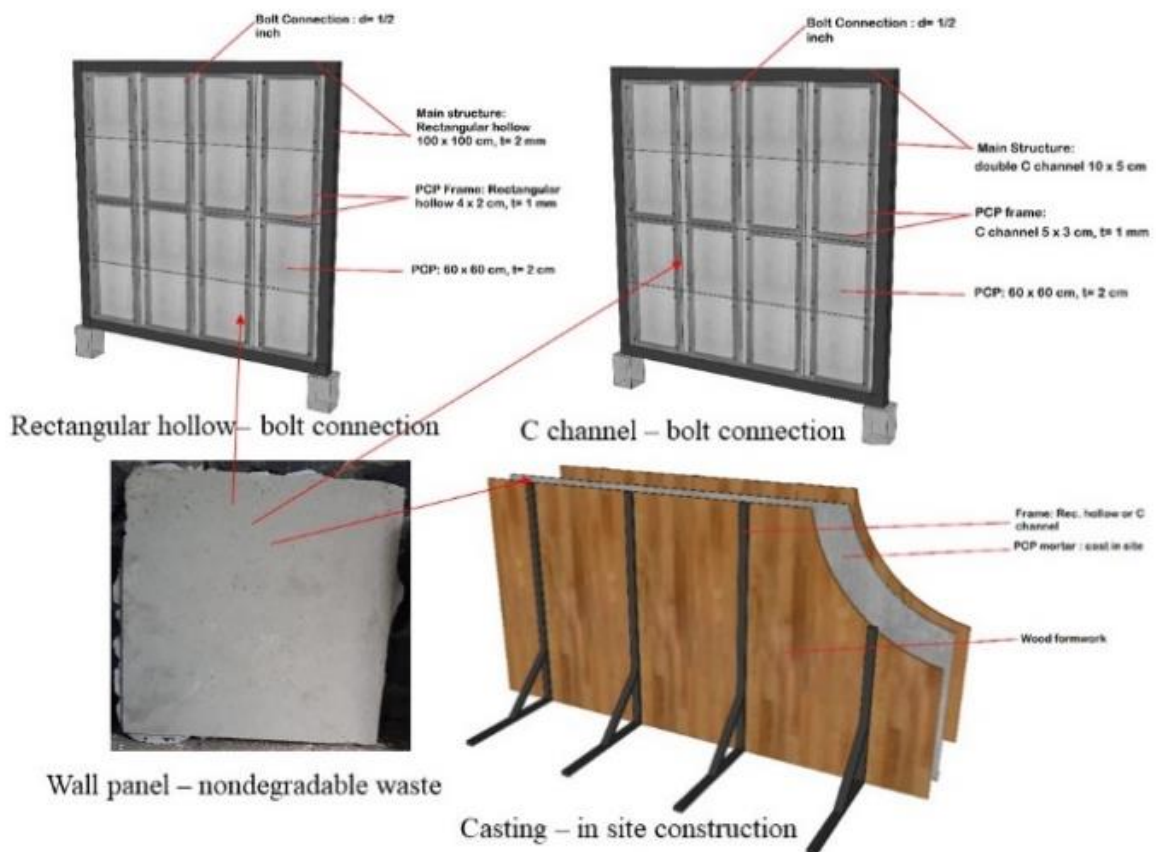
Comparative study of Installation and Connection Design of Prefabricated Wall Panel [304]
